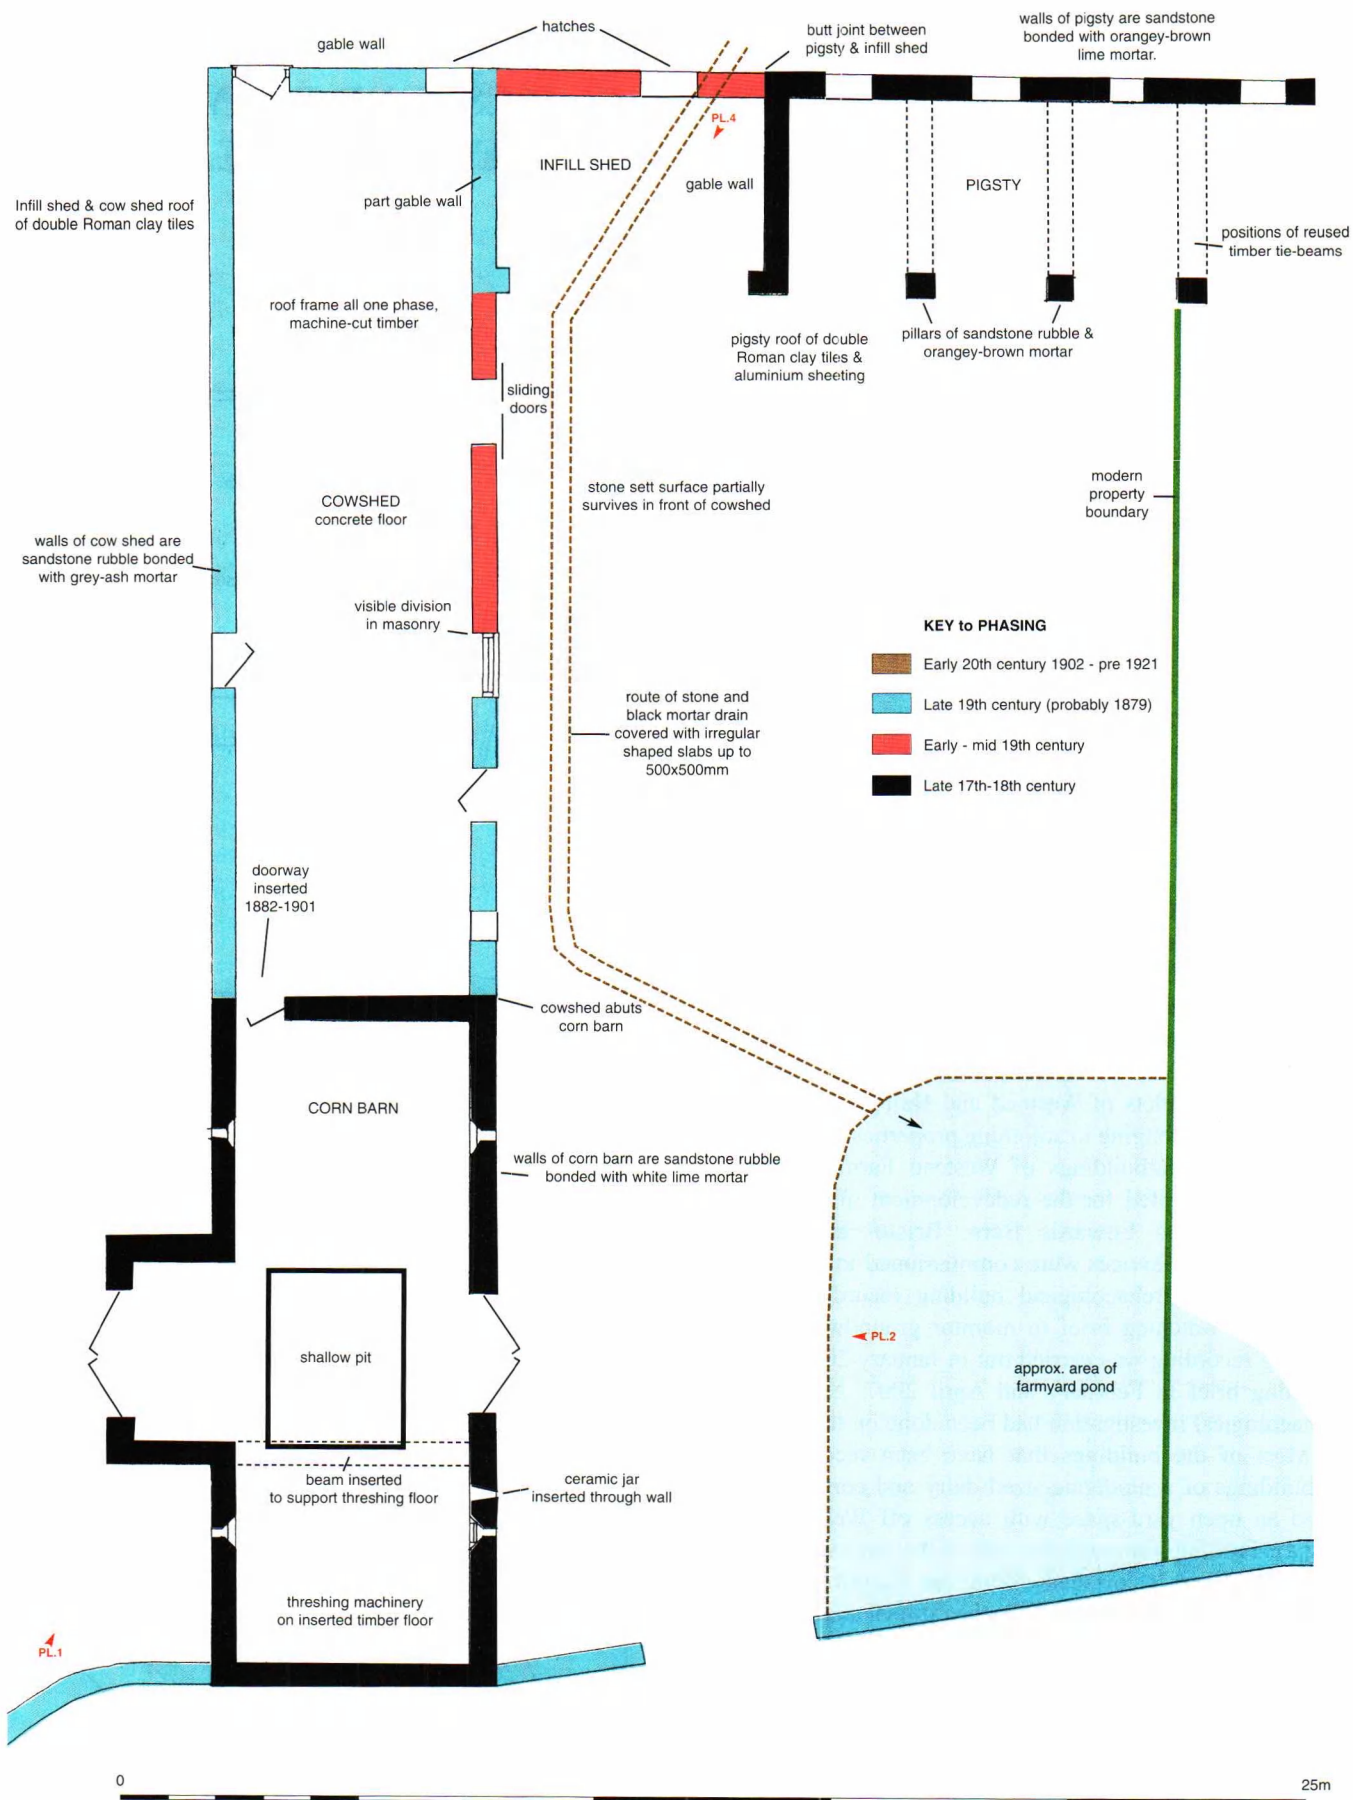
Annotated ground floor plan of corn barn, pigsty, infill shed & cowshed, showing plate directions and phasing.
